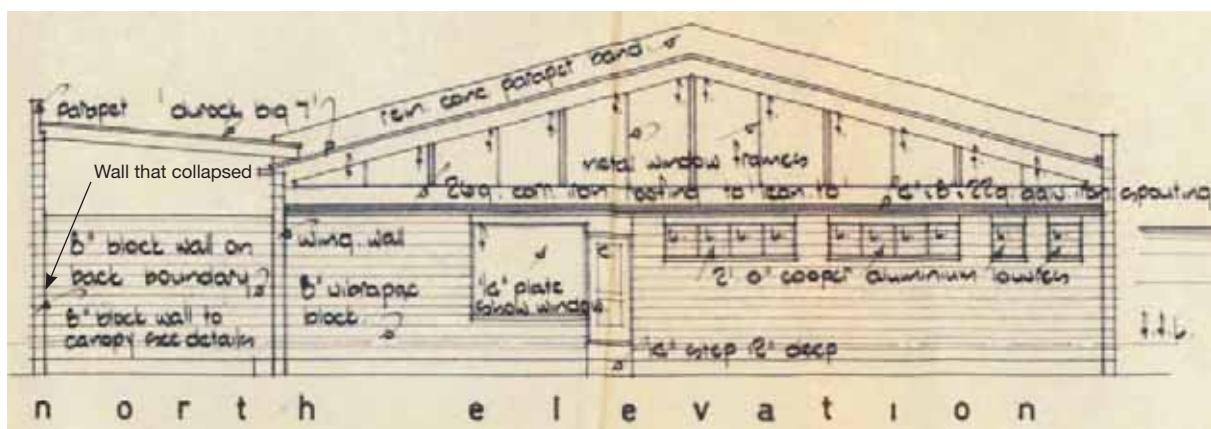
A section from the original plan of the building, showing the wall at left with its lean-to roof attached
